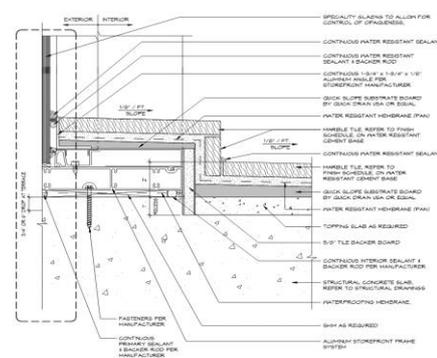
De-identified Shower Storefront Sill Detail Showing Required Step and Pan Termination over the Sill at a Continuous Aluminum Angle
